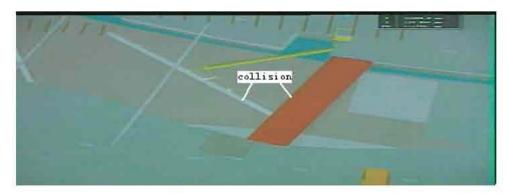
Collision occurred between the girder of central over bridge and the walking over bridge
